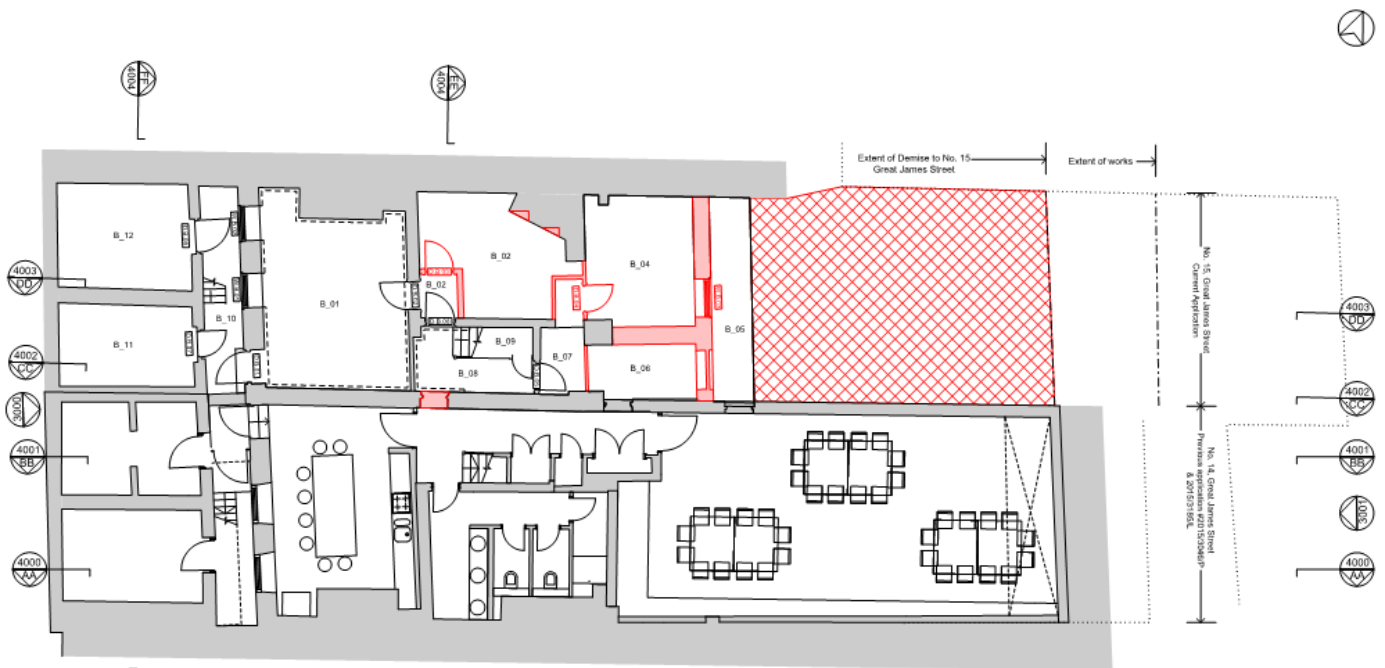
Owen Architect’s preliminary plan view of proposed works at lower ground floor level. Red hatch indicates the proposed excavation area. Solid red hatches indicate existing structural elements planned to be demolished.
